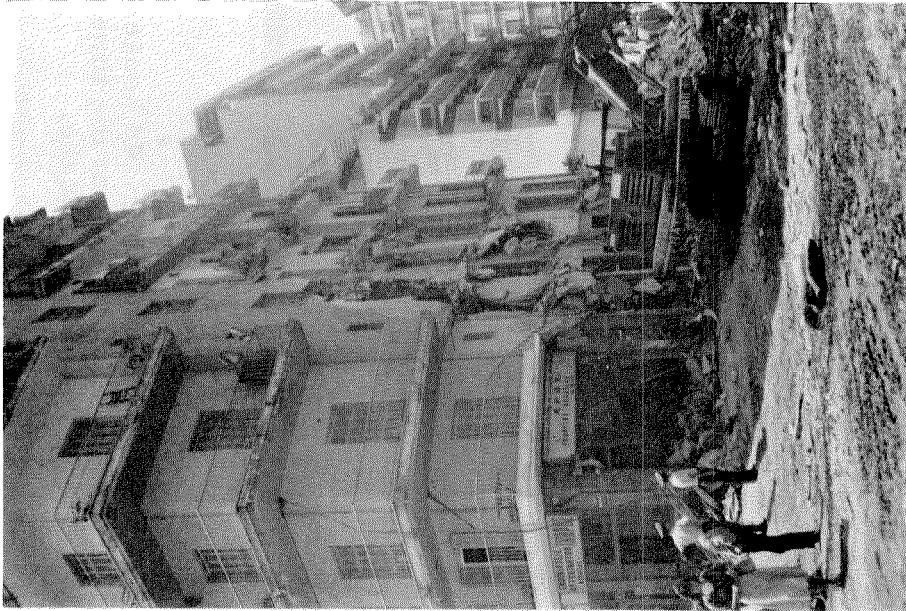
Severe damage inflicted to adjacent buildings by the fall of the 8-storey apartment building at Ippodromiou street.
